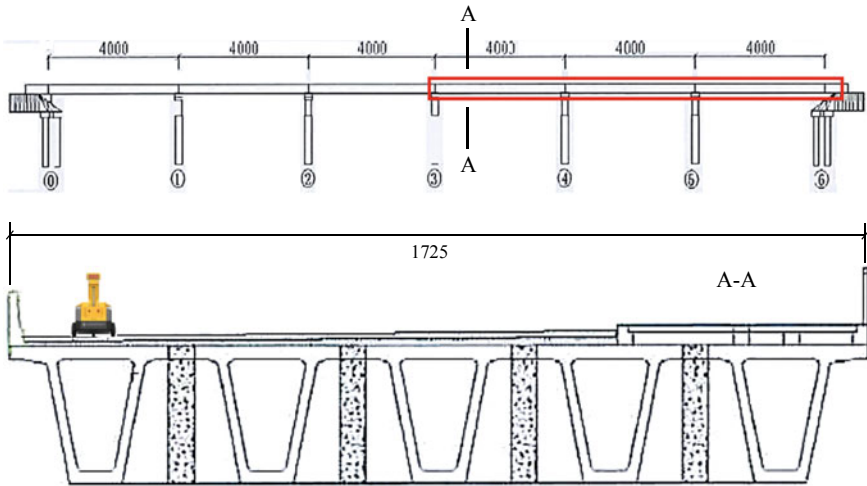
The drawing of Yan-Zi-Yan bridge (unit: cm). Red box indicates the inspection spans
